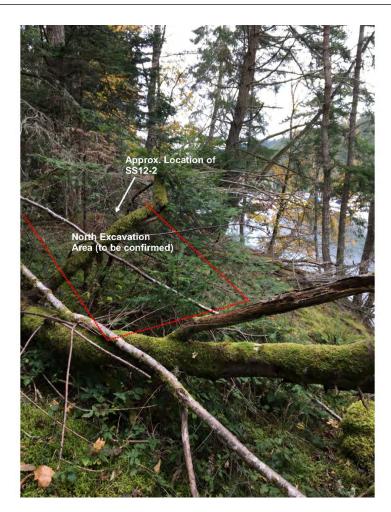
North excavation area, looking north-northeast toward bay (excavation extent to be confirmed by contractor prior to start of work).
